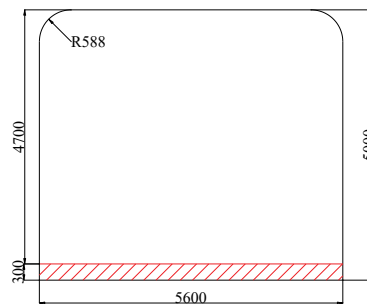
Rehabilitated Cross-Section Design of the 1101 Roadway
